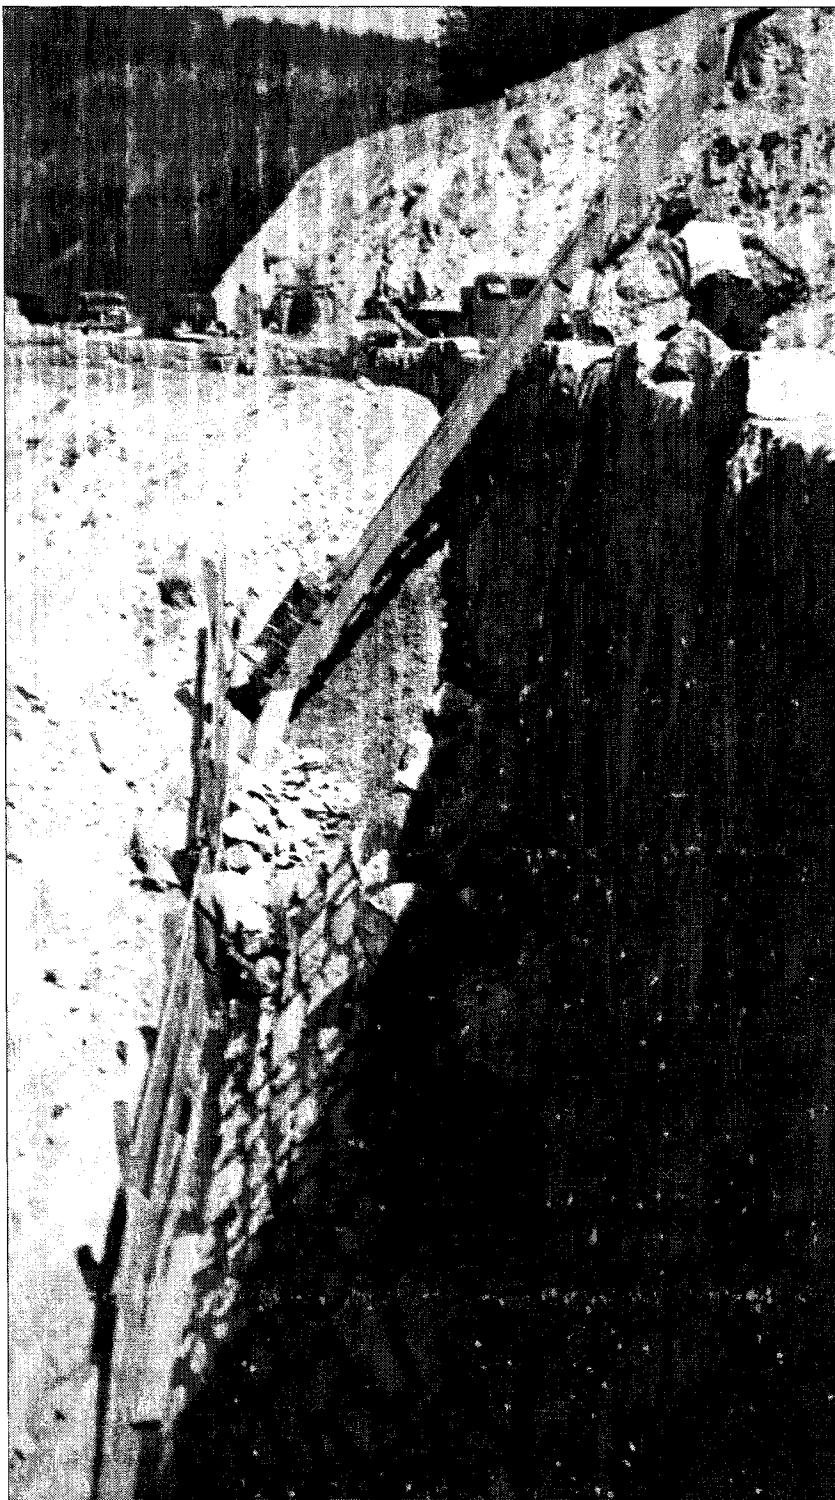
Historic photo showing construction of hand-laid rip rap on fill slope of Stevens Canyon, 1940 (MORA Archive).
